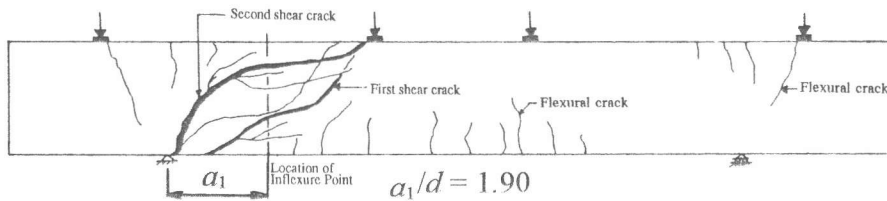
Crack Pattern of Typical Beams at Failure Condition
